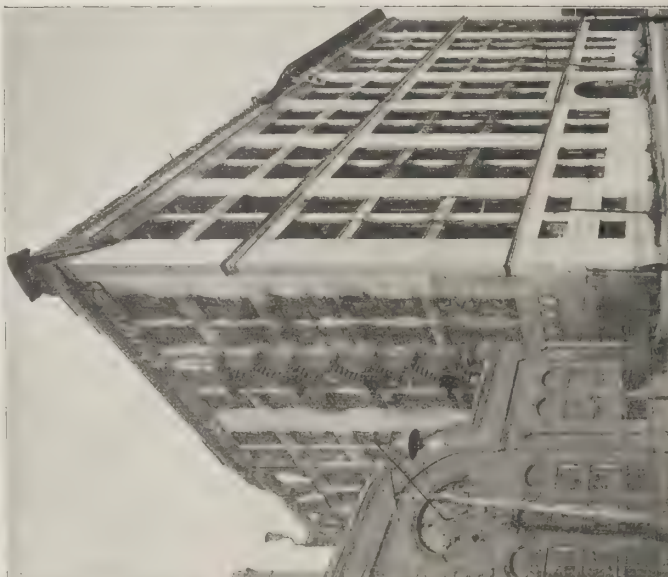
Side and rear of Horne Department Store, showing where riveted roof girder pulled out column in rear wall caused by fall of water tank.
